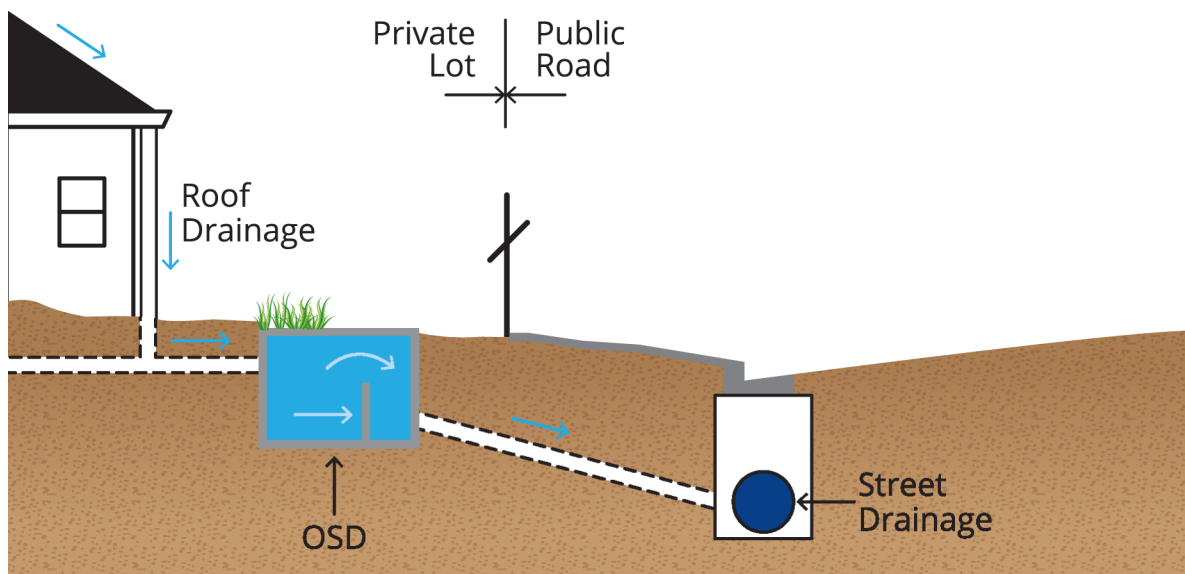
Typical Section Through a Below Ground On-Site Detention
